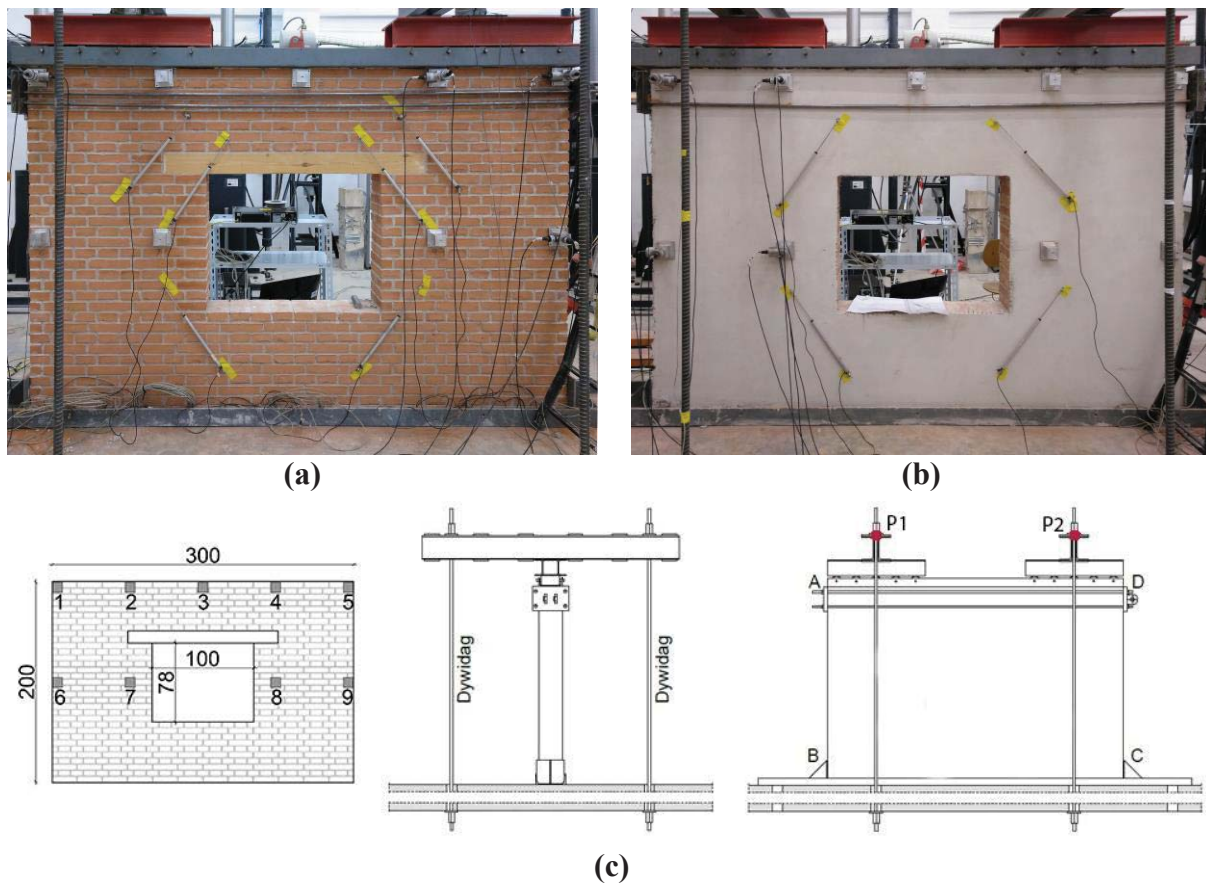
(a) Unreinforced and (b) reinforced windowed masonry walls in the undamaged state; (c) scheme of the experimental setup: preload device and anchorage system.
